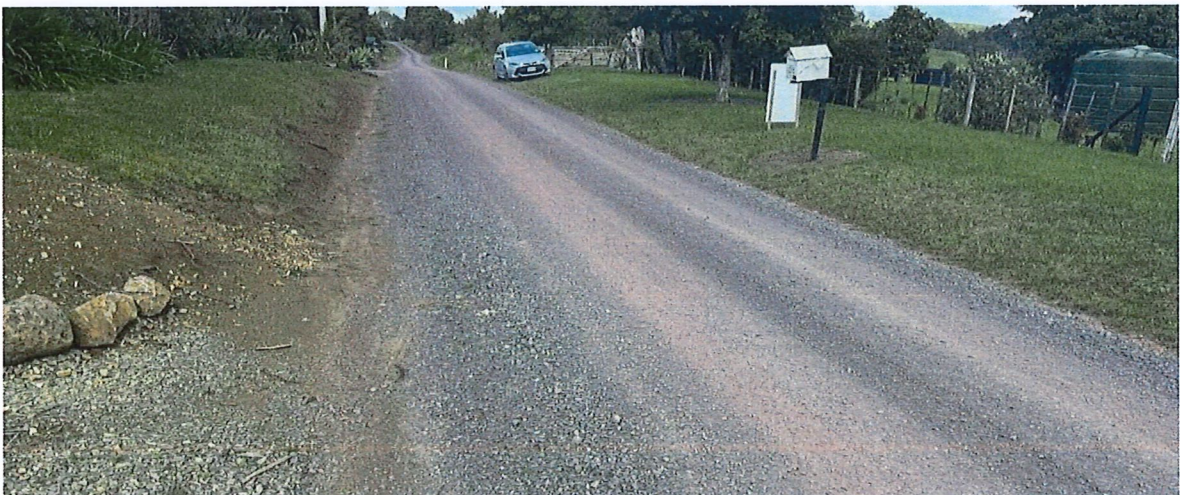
Looking south along Okokako Road from 2220 metres. Additional widening is proposed over the crest at upper centre.
